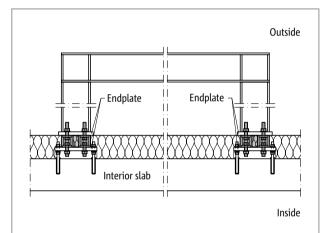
Schöck Isokorb® T Type S-V for rigid frame connection for secondary structures (additional moments from imperfections are to be taken into account)
